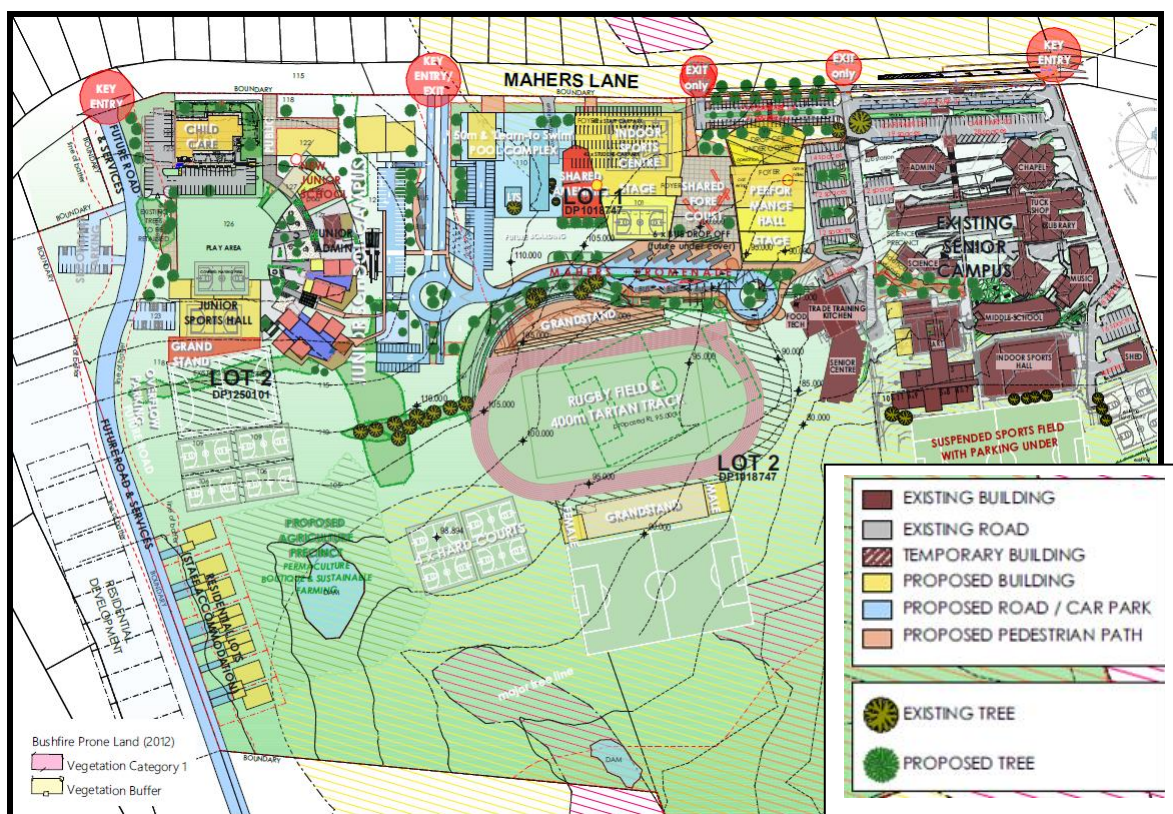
Proposed Masterplan for the School (Source: Raunik, March 2023)
